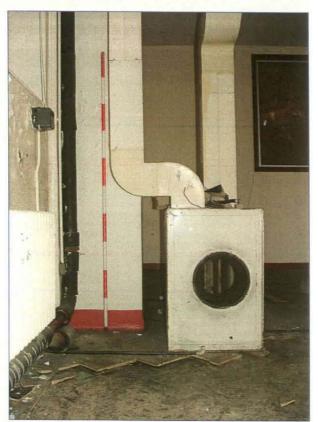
Fan unit casing, ground floor hall (Scale = 2m)
